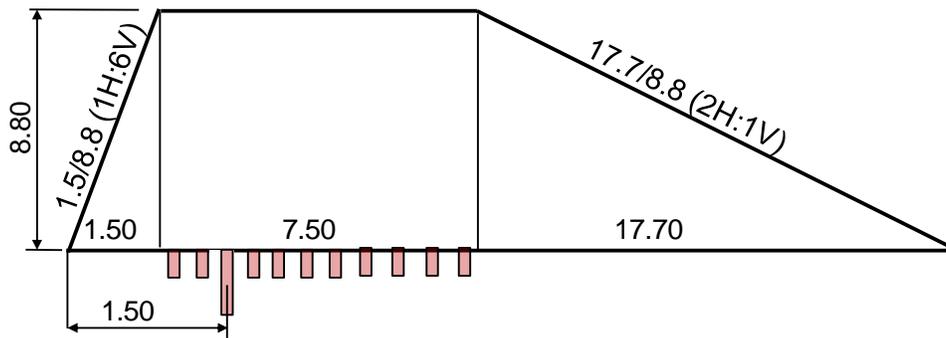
Cross section of embankment at pile abutment next to the pile row.
